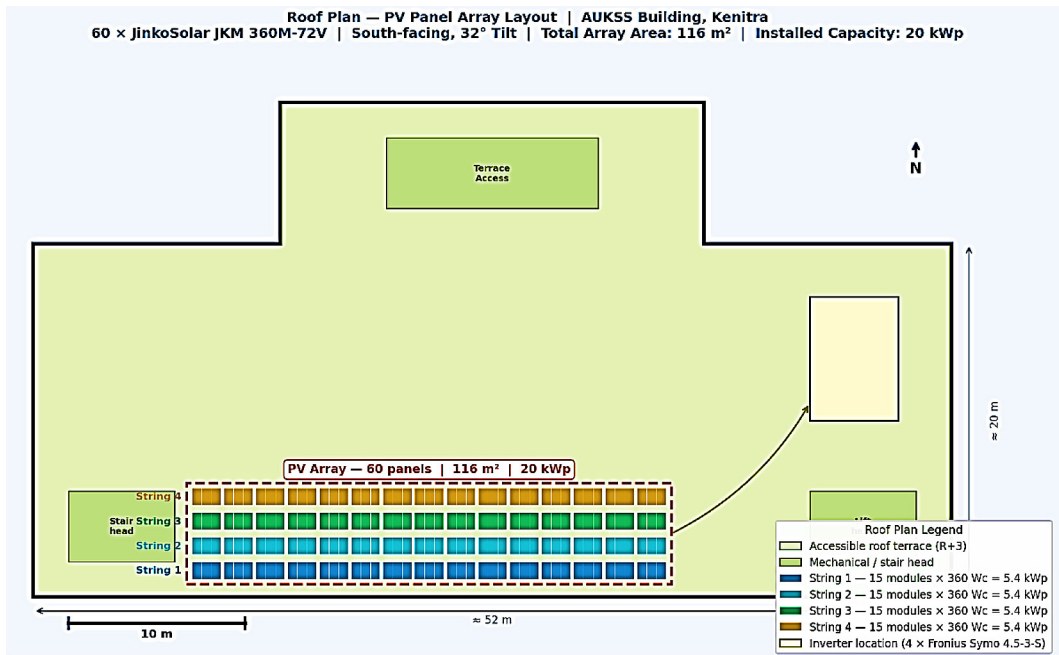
Schematic roof plan of the AUKSS building (R+3 terrace) showing the proposed PV array layout
